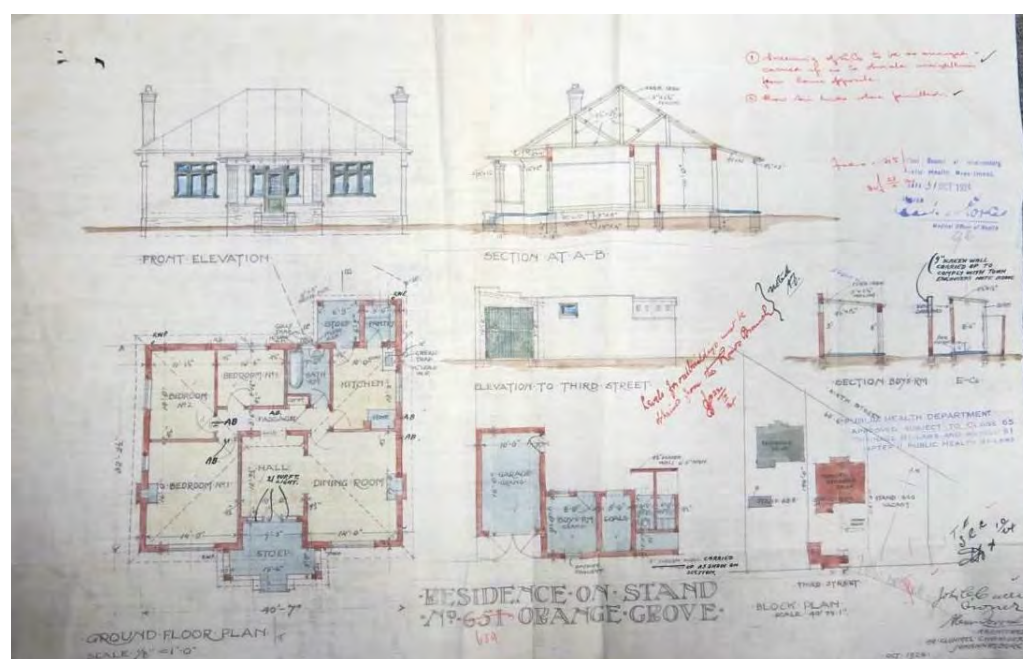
Plan for proposed new houses on Stand 659, Orange Grove from 1924
